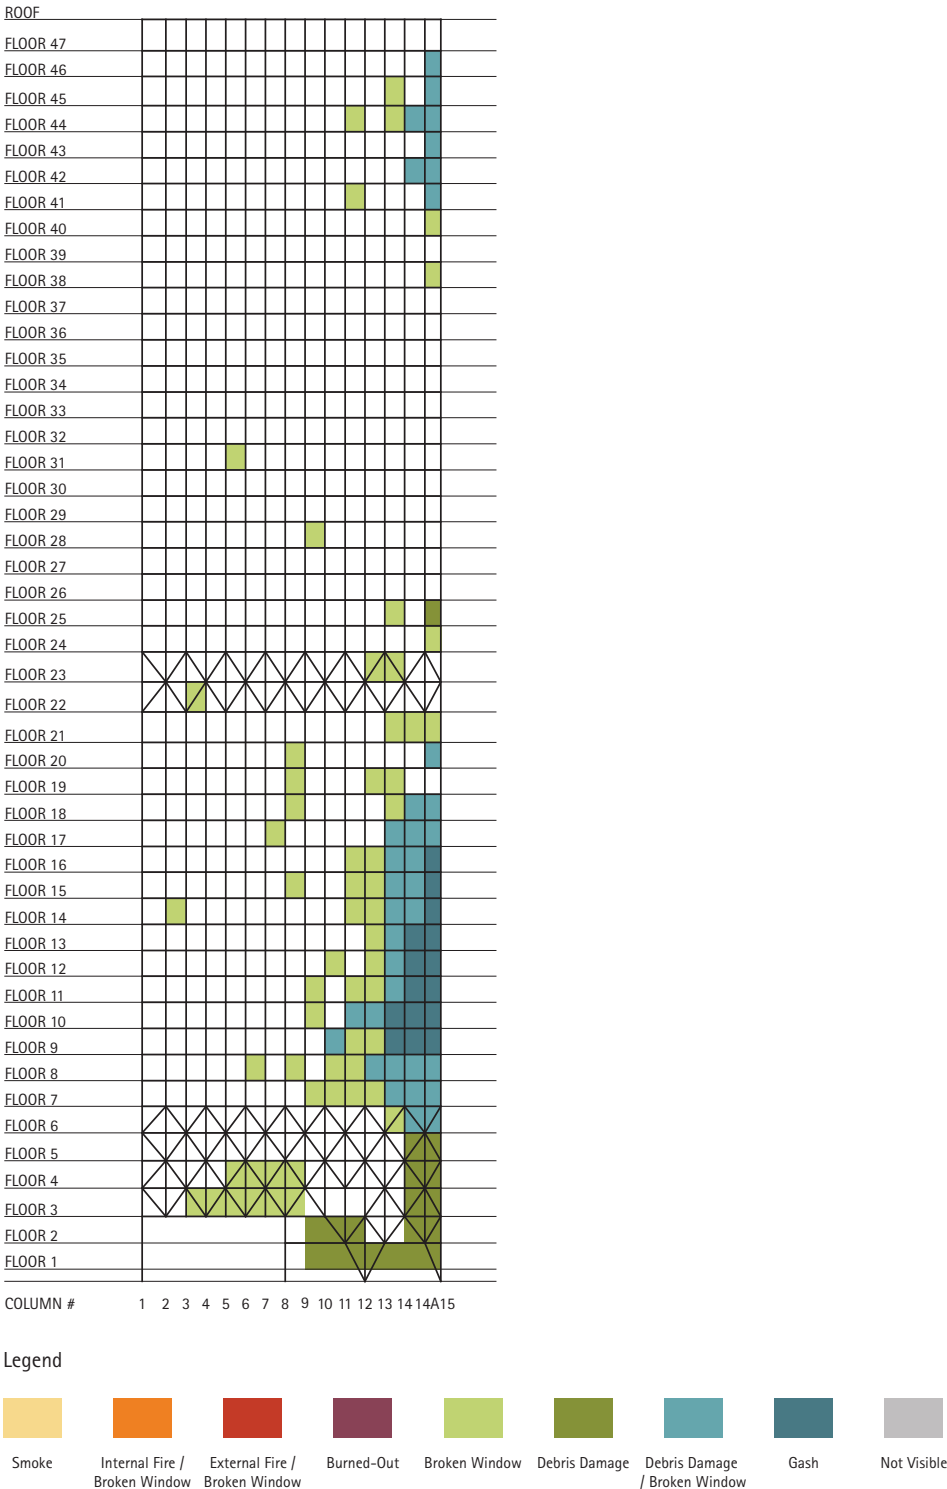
W.01 WTC7 West facade - Debris Damage after WTC1 collapse
